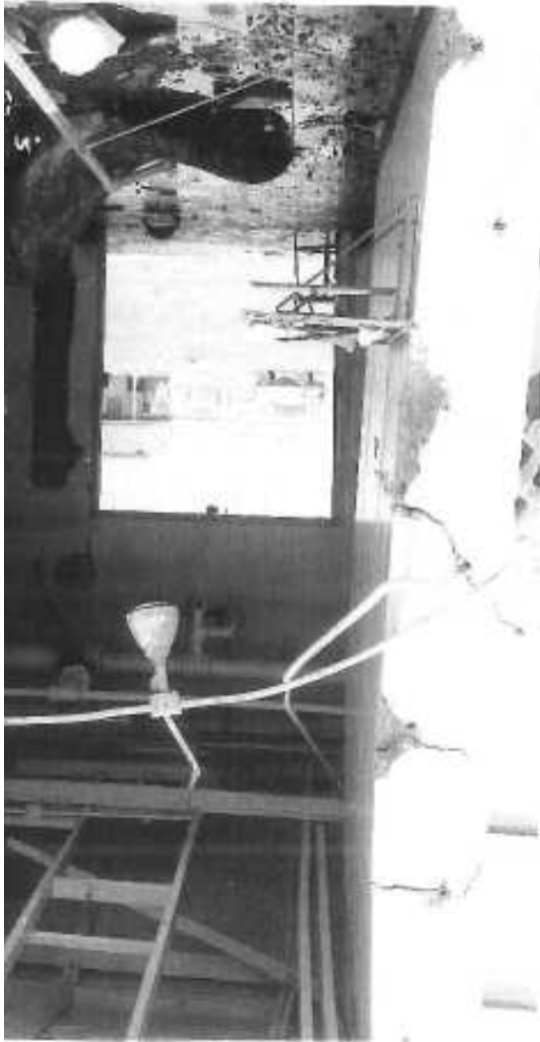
Concrete cracking on the outside (acceptor) faces of the donor cubicle.
